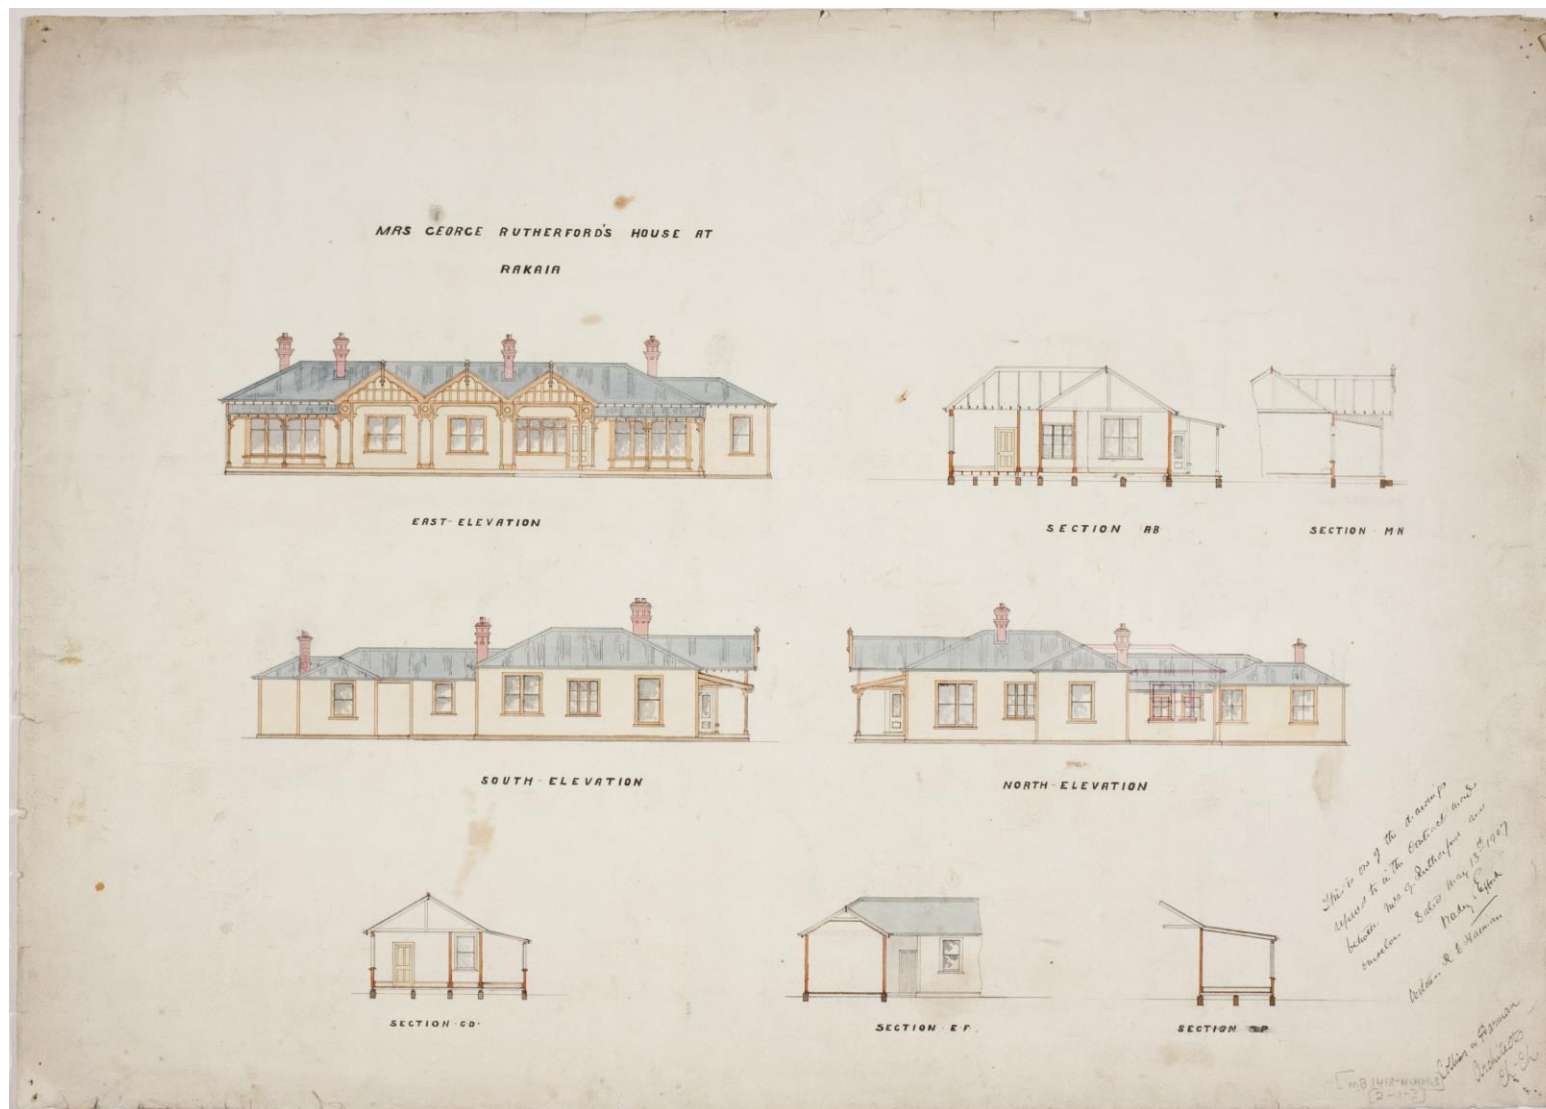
Collins and Harman, Mrs George Rutherford's House at Rakaia, elevations and sections (1907).
